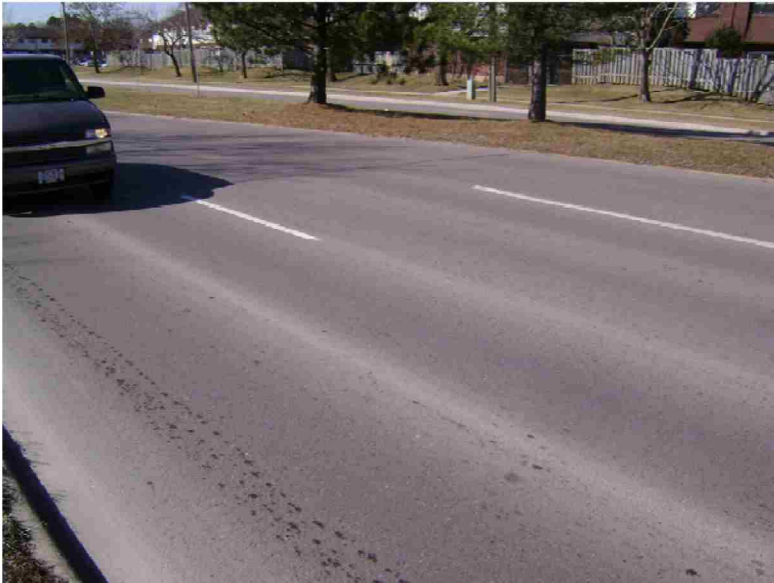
B - Garth (Linc to Stonechurch) Warm Mix Asphalt
